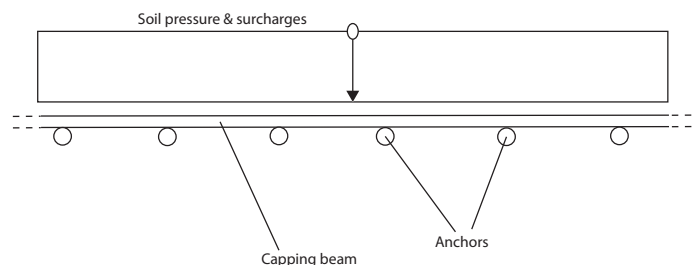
Plan view of capping beam idealized as a continuous beam supported by anchors.
